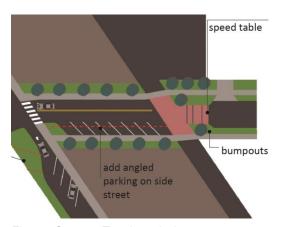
Traffic calming recommendation from the 2013 Southern Gateway Urban Design Plan.
